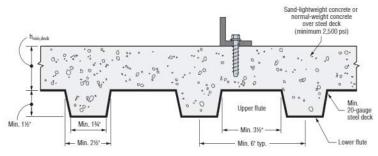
Installation of ¼"- and %"-Diameter Anchors in the Topside of Concrete over Metal Deck
